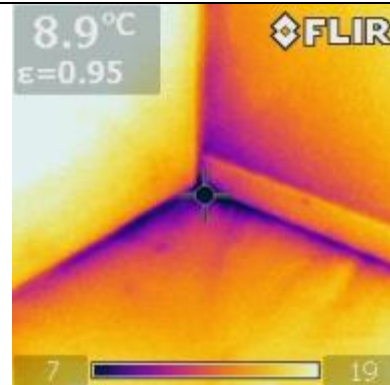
Leak through balcony door (between arch and frame/ doorstep).
